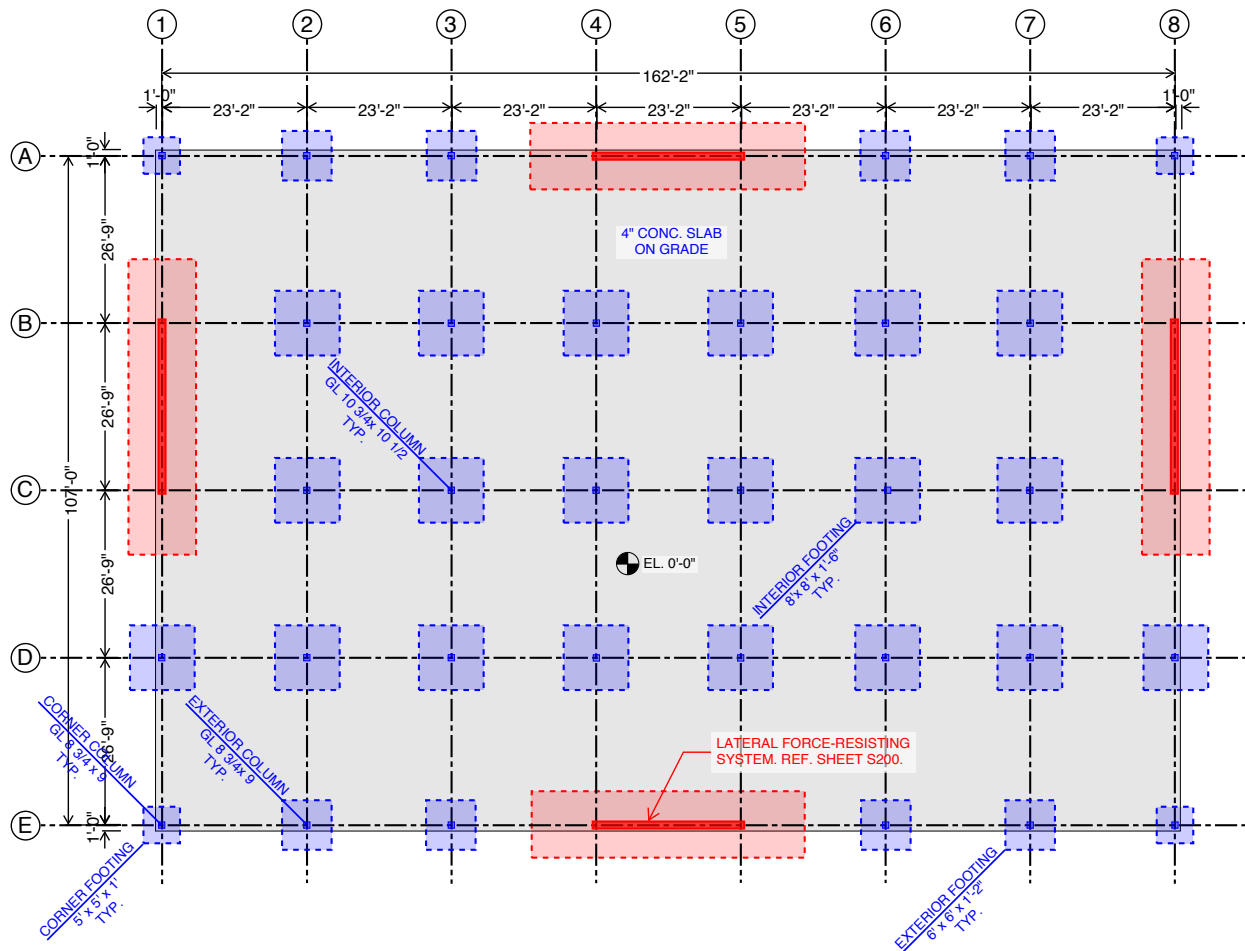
First floor and foundation plan for the medium mass timber office buildings
